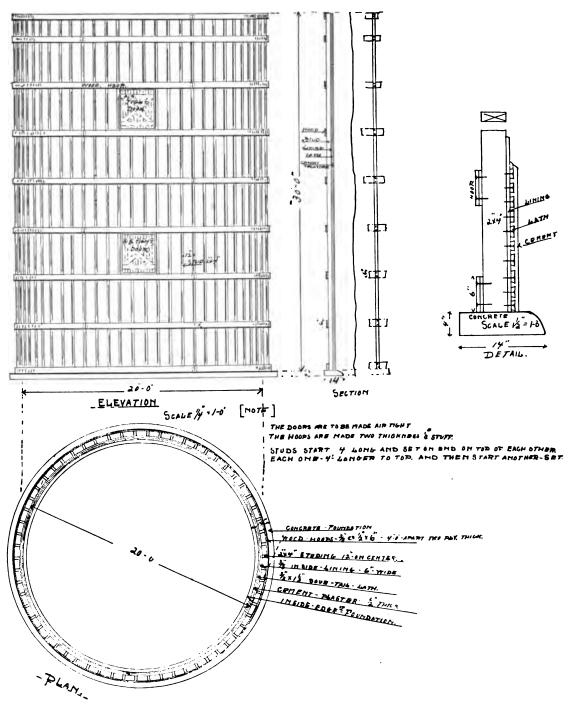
CONSTRUCTION AND TYPE OF ILLINOIS SILO.
